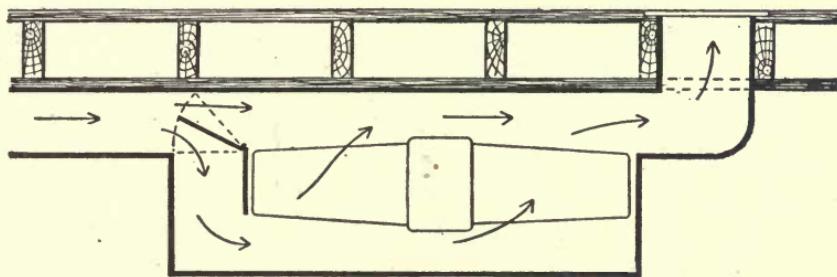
Another Arrangement of Mixing Damper and Heater in Galvanized-Iron Casing. Heater between Damper and Register.
